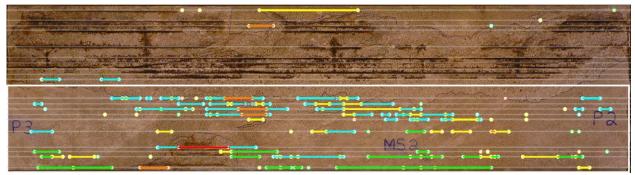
Damage Profile for Main Street Bridge Beam 2
